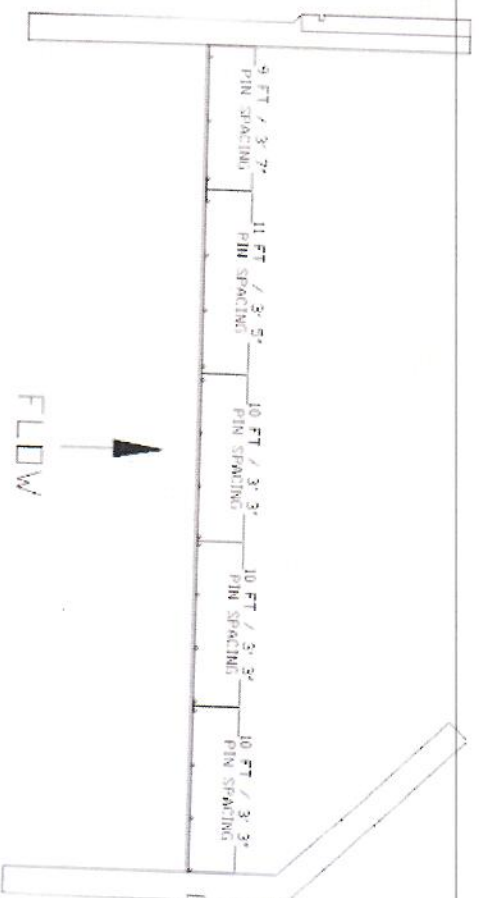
pins spacing as found by QCC in As-Built Drawings, 1-1/4" diam. steel pipe pins, with 3'-3" high flashboards
